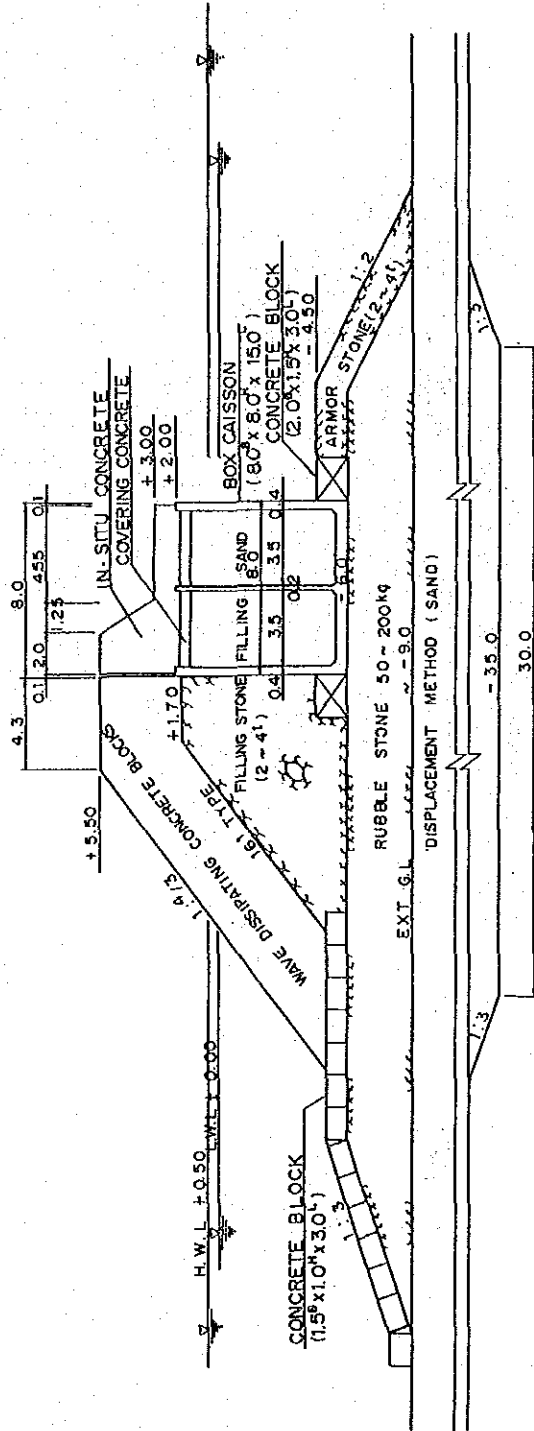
(A-e) ③ BREAKWATER (3) (PLAN A) (Unit: m)
